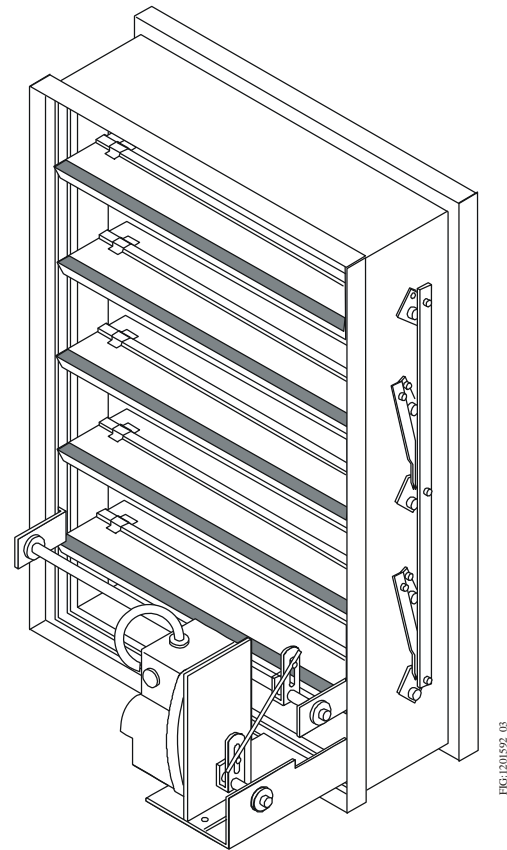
Smoke Damper System with Internally Mounted Electric Actuator
